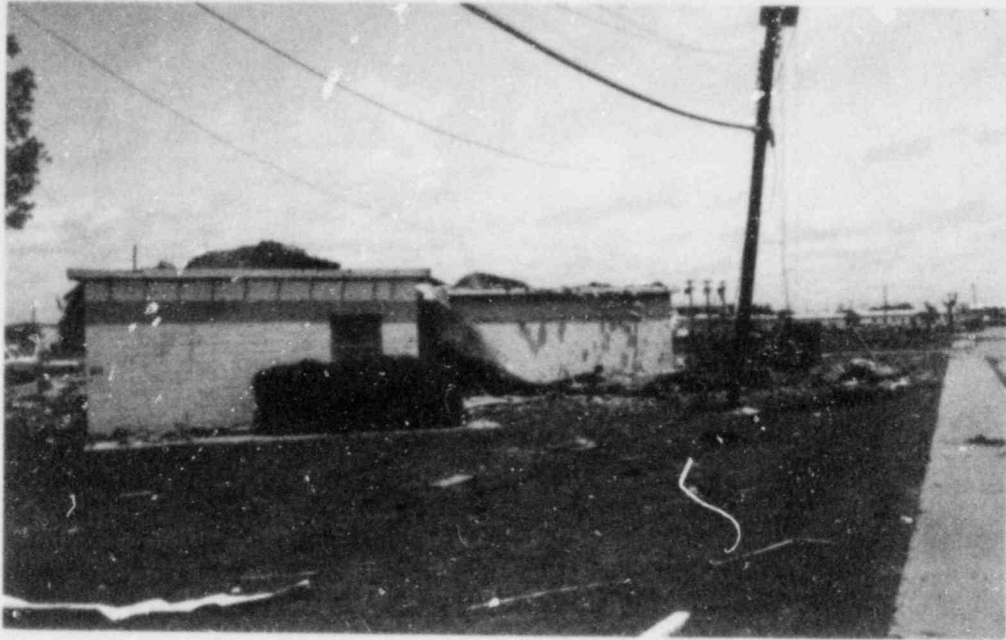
DAMAGE TO COMMUNICATIONS BUILDING (eight ft wide sections of lightweight roof slab were lifted).
